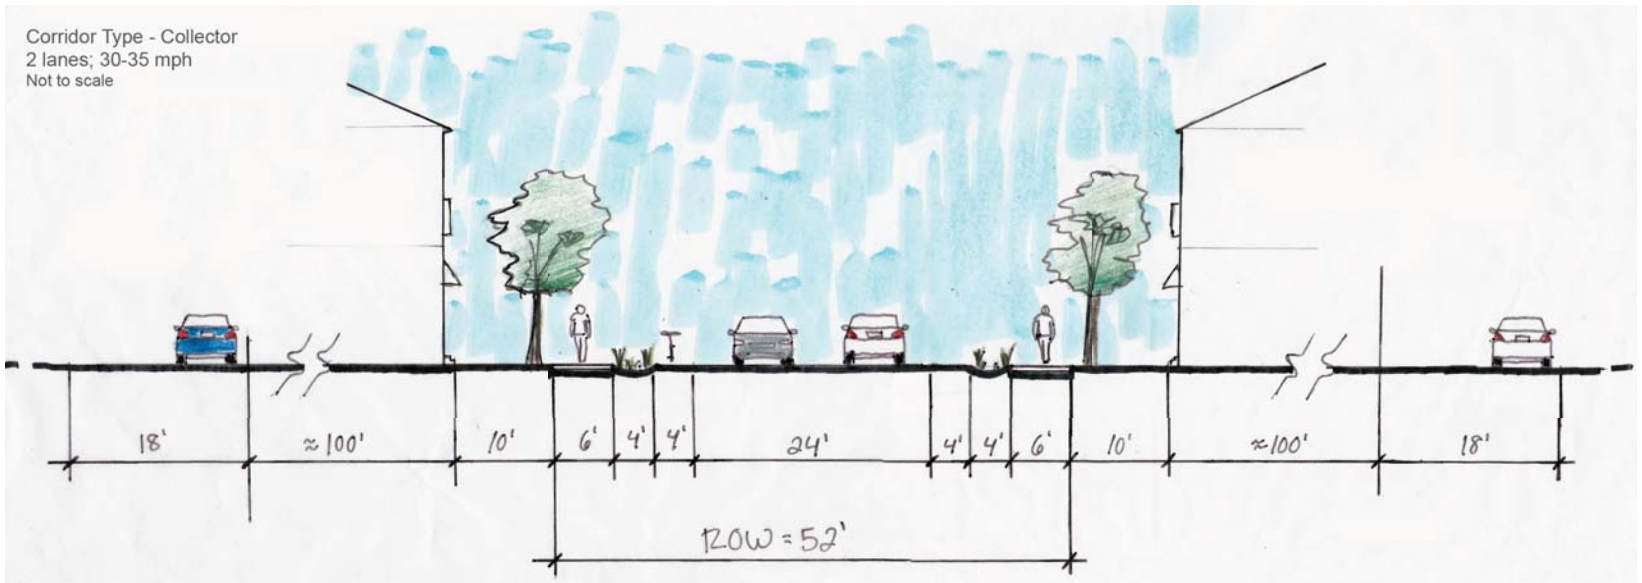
Collector Street Section. Source: Drawn by author.
